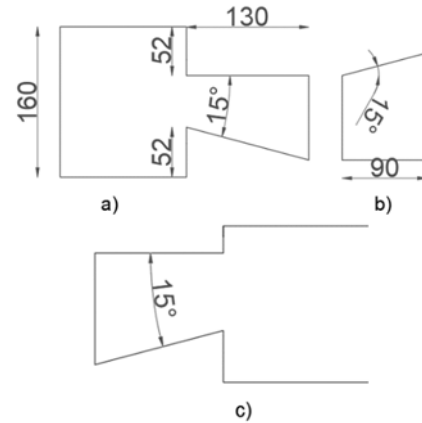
Dovetail dimensions detail a) front view b) end view c) front view
